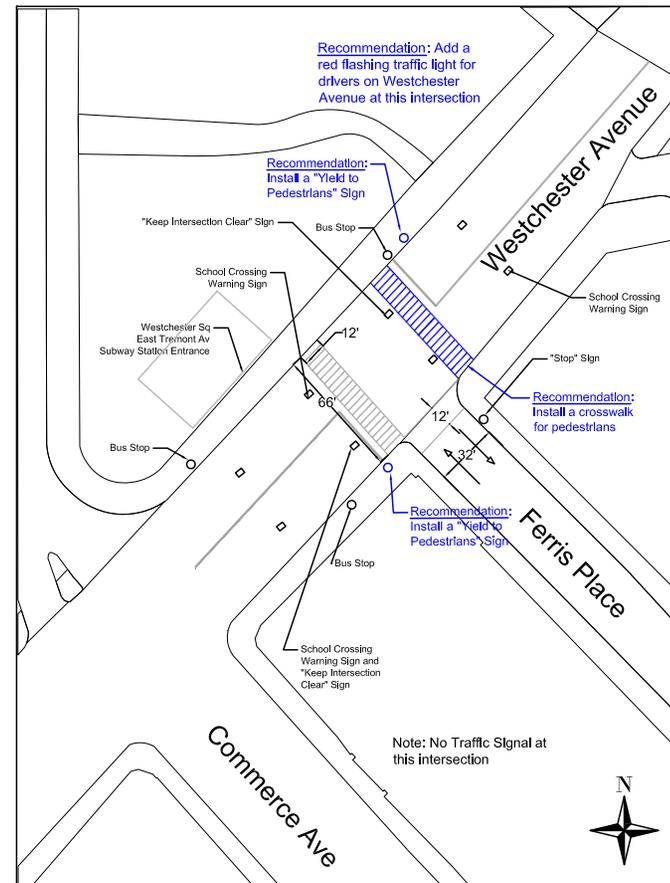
Intersection of Westchester Avenue and Ferris Place (with proposed improvements)
